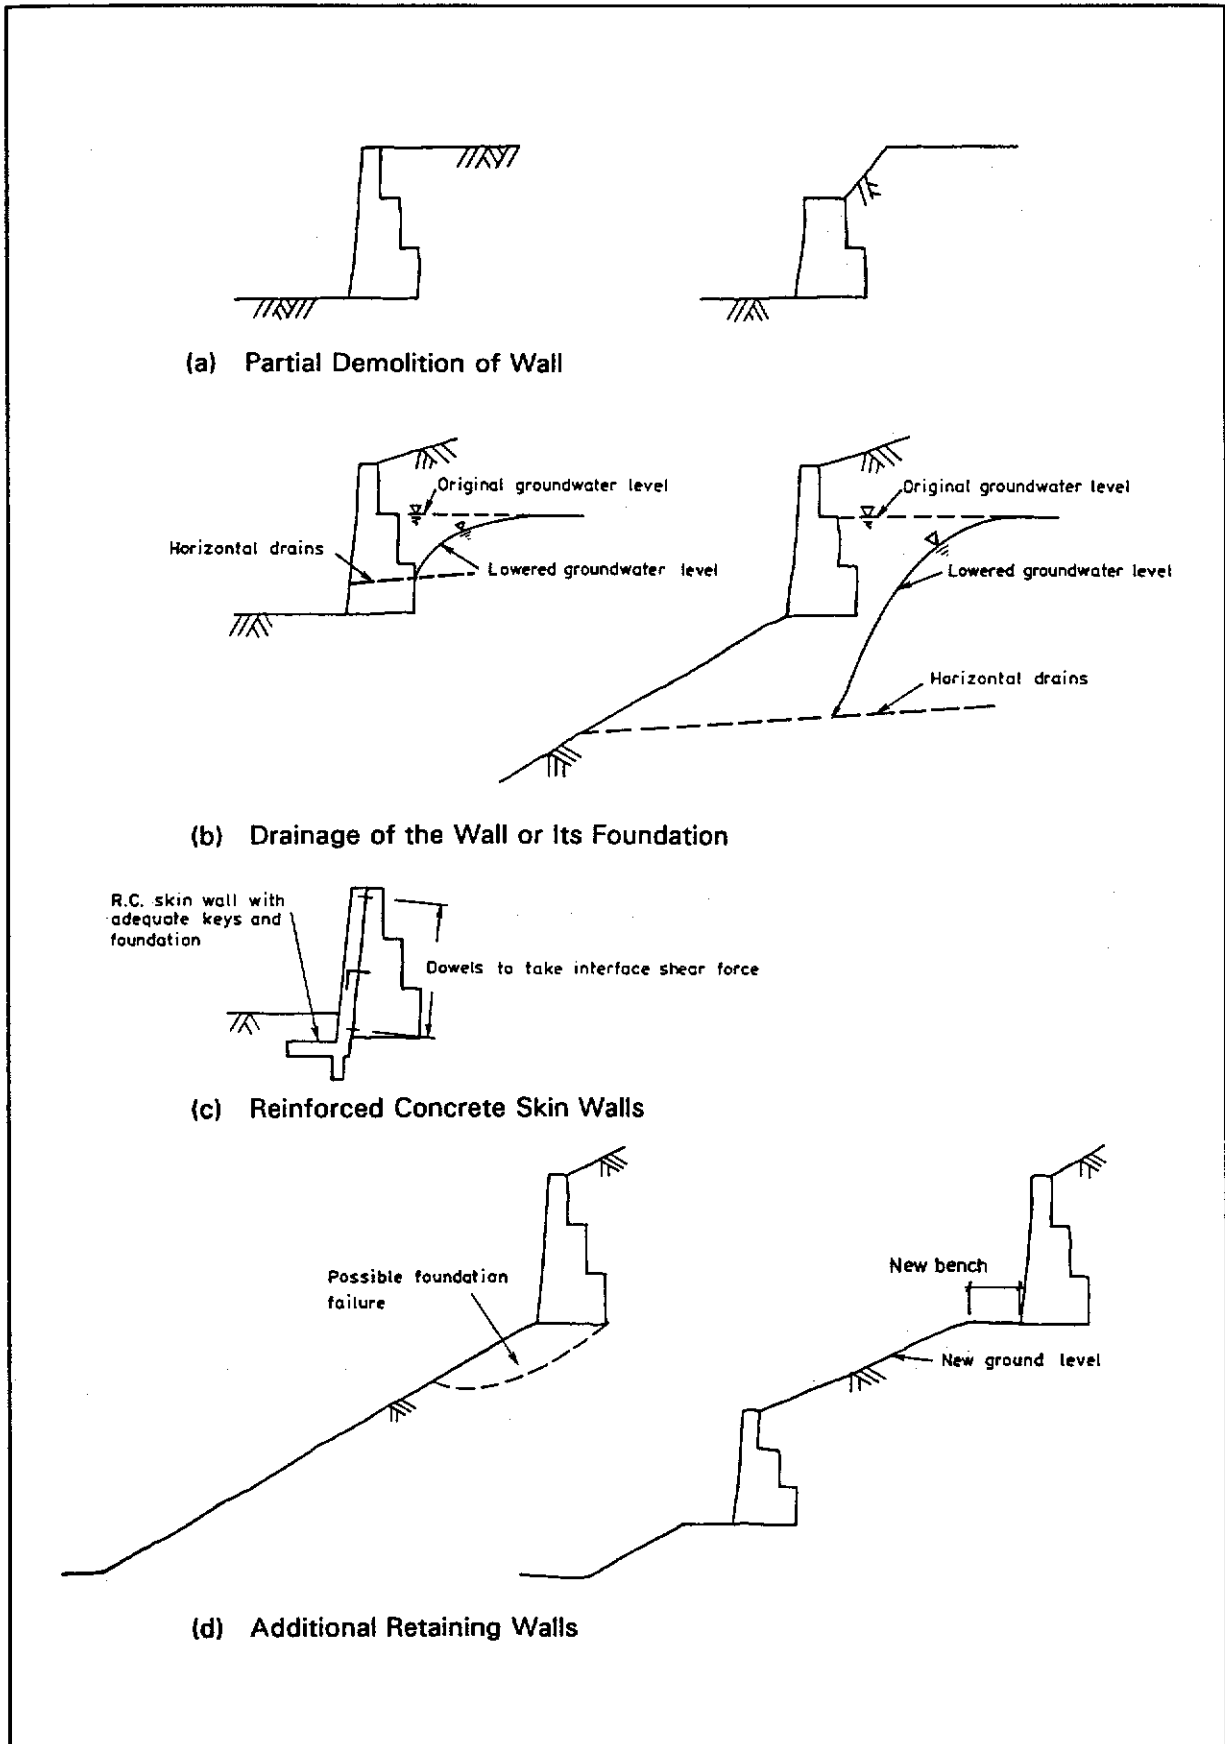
Methods of Stabilising Old Masonry Retaining Walls
